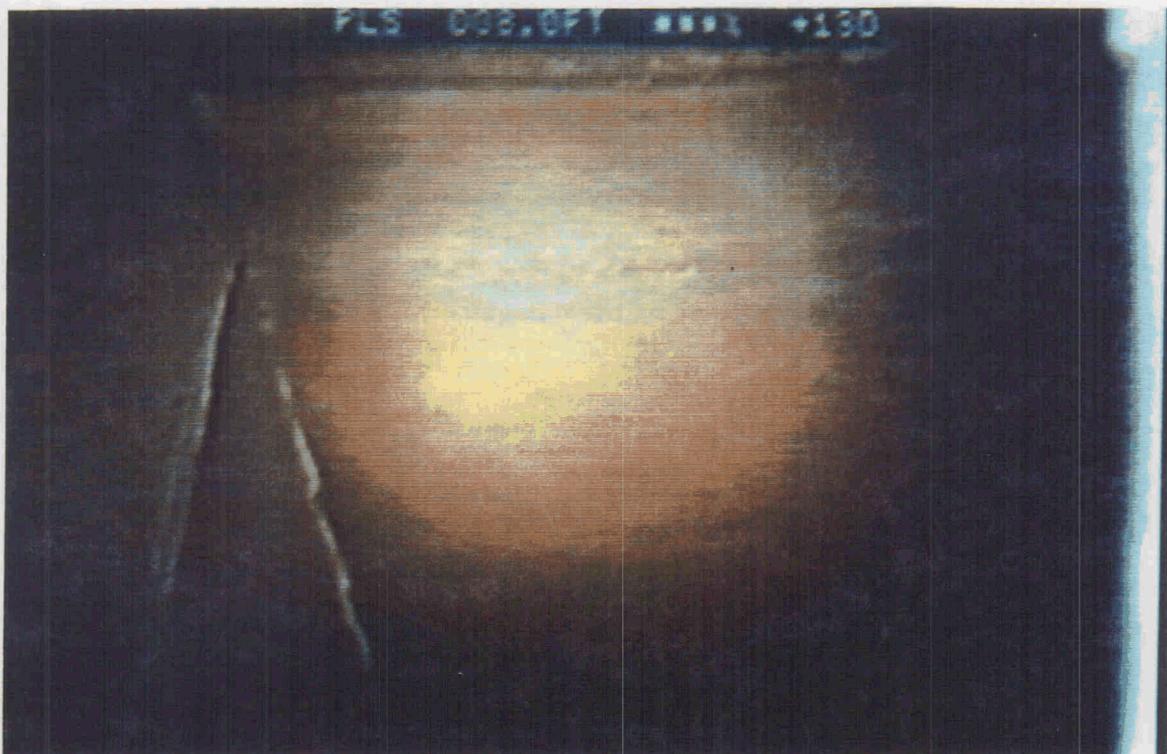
Inside view of welded seams on Sect. 3 wall and roof.
